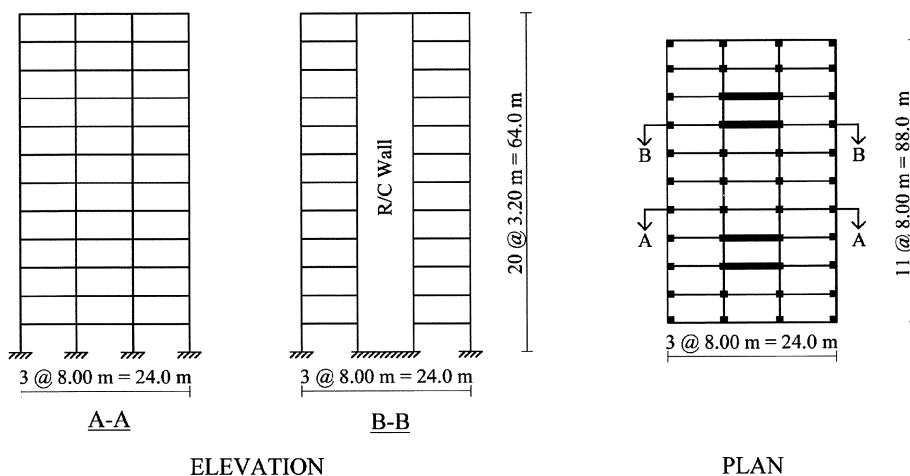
Elevations and plan of a 20-storey reinforced concrete building.
